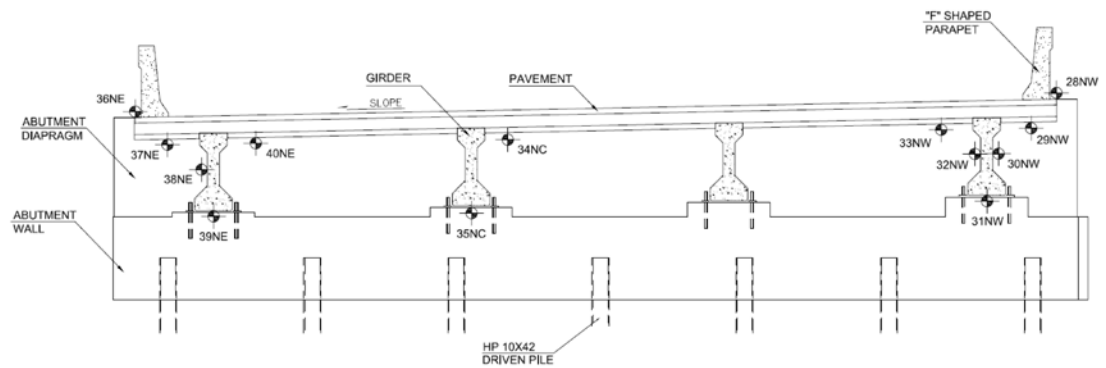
Locations of Thermistors on the North Side of the Bridge (after Hanlon, 2010)
